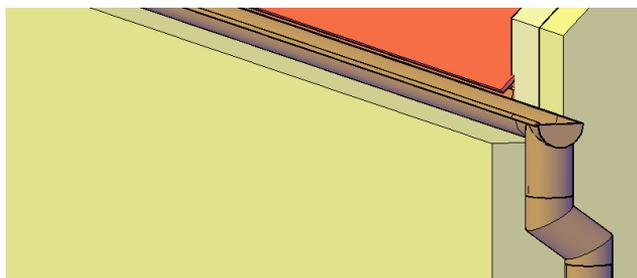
Roof drainage of modeled passive house with details of rainspout and stack
